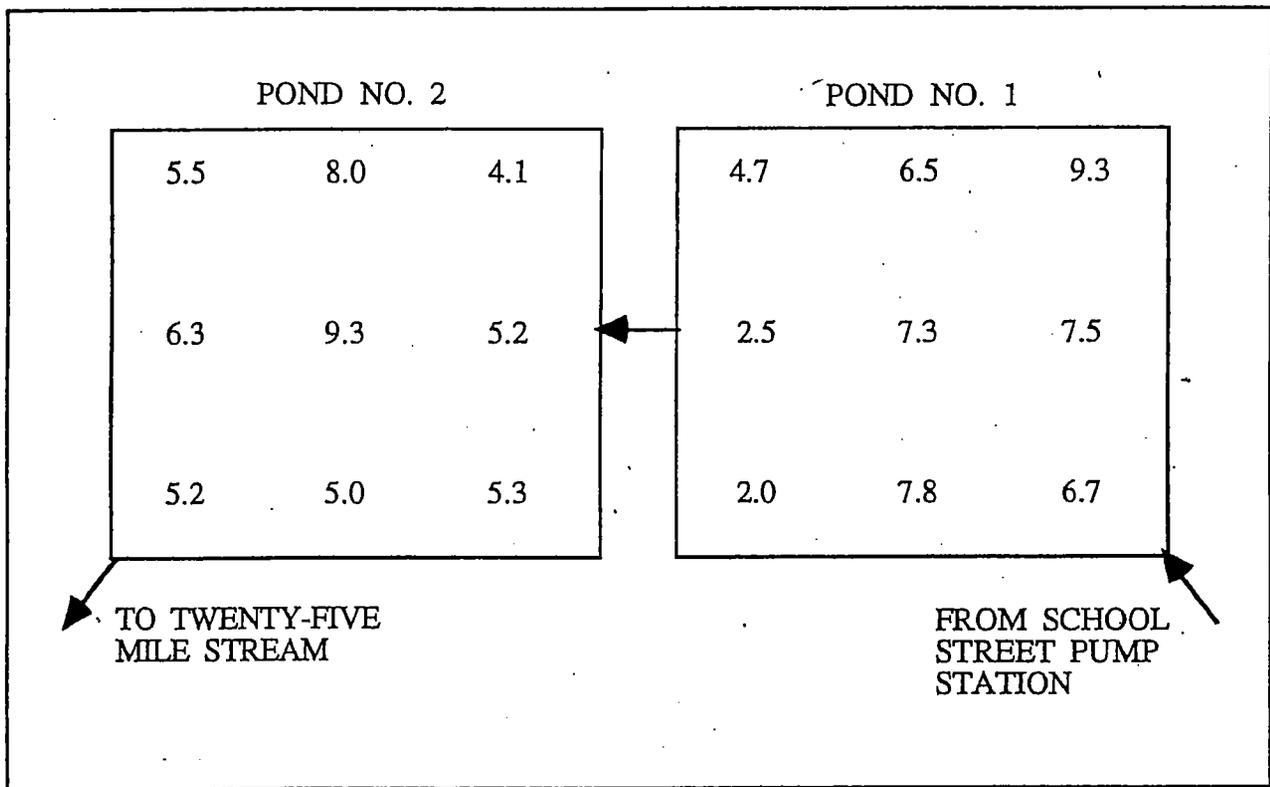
UNITY'S STABILIZATION POND AS-BUILT DEPTHS (FT)
